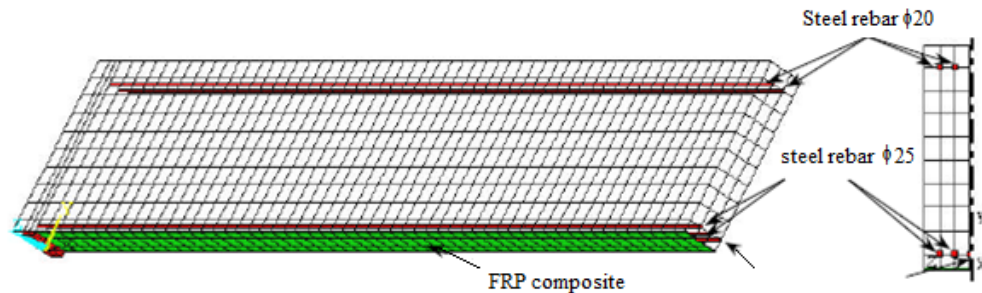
Finite element model of the reinforced concrete beam strengthened with FRP laminate [49]
